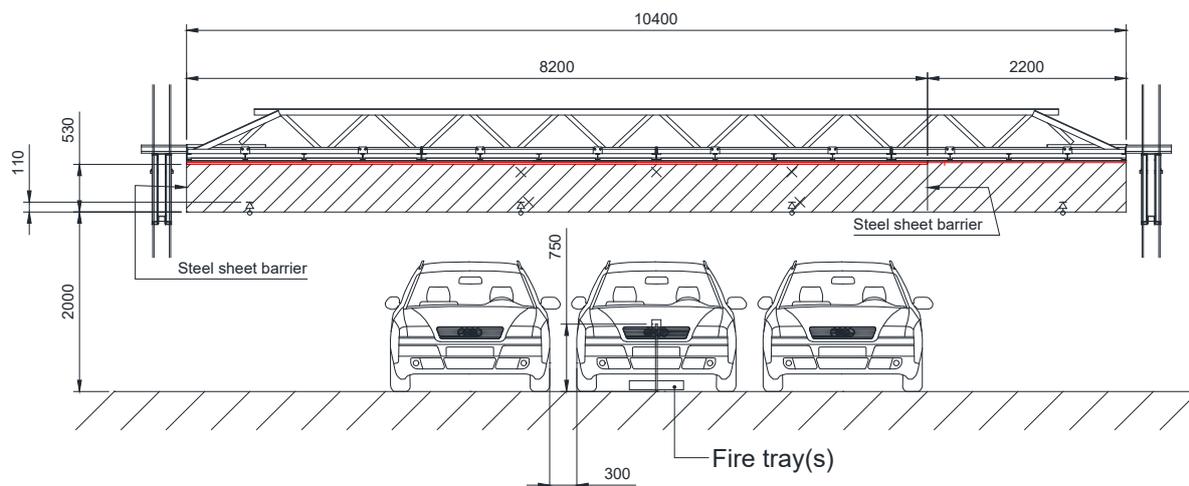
A sketch of the suspended ceiling and beam arrangement.
